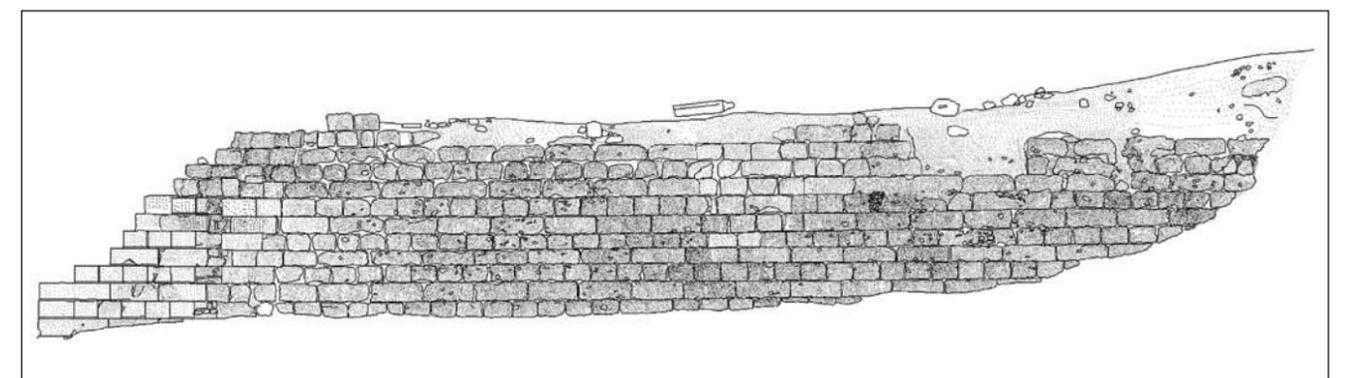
Plan of the digital surface model of the elevation of the east side retaining wall of the cavea of the theatre of Dionysos. D. Mavromati, 2005.
